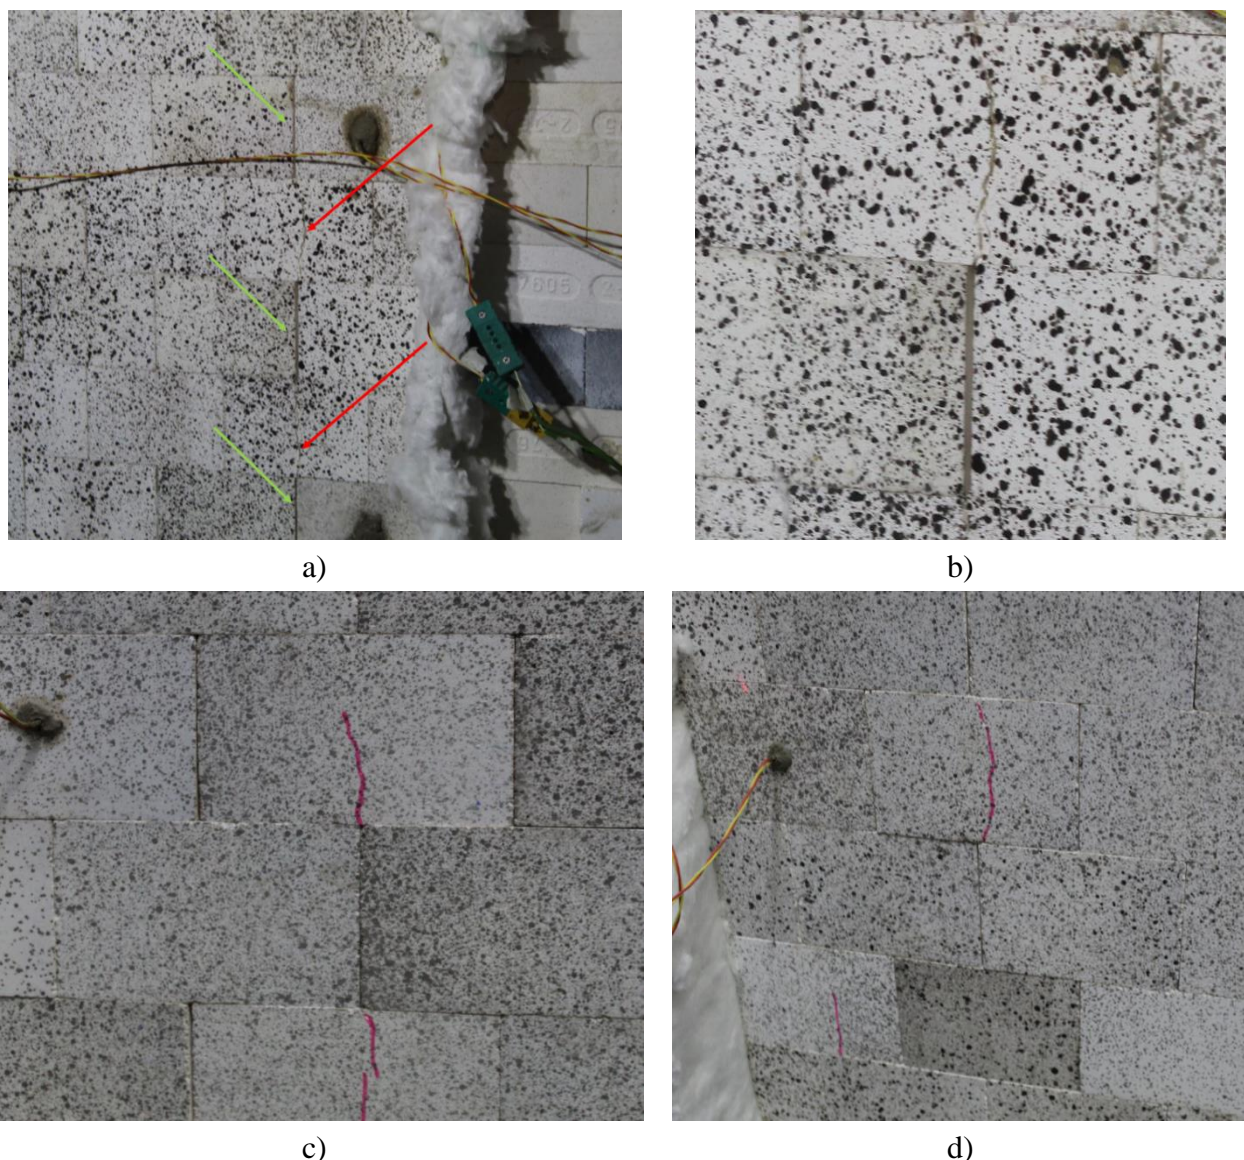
Test series S03 – Damage in the wall upon completion of the test: a) Vertical cracks in bricks and joint openings; b) Crack details; c) Cracks details; d) Cracks details
